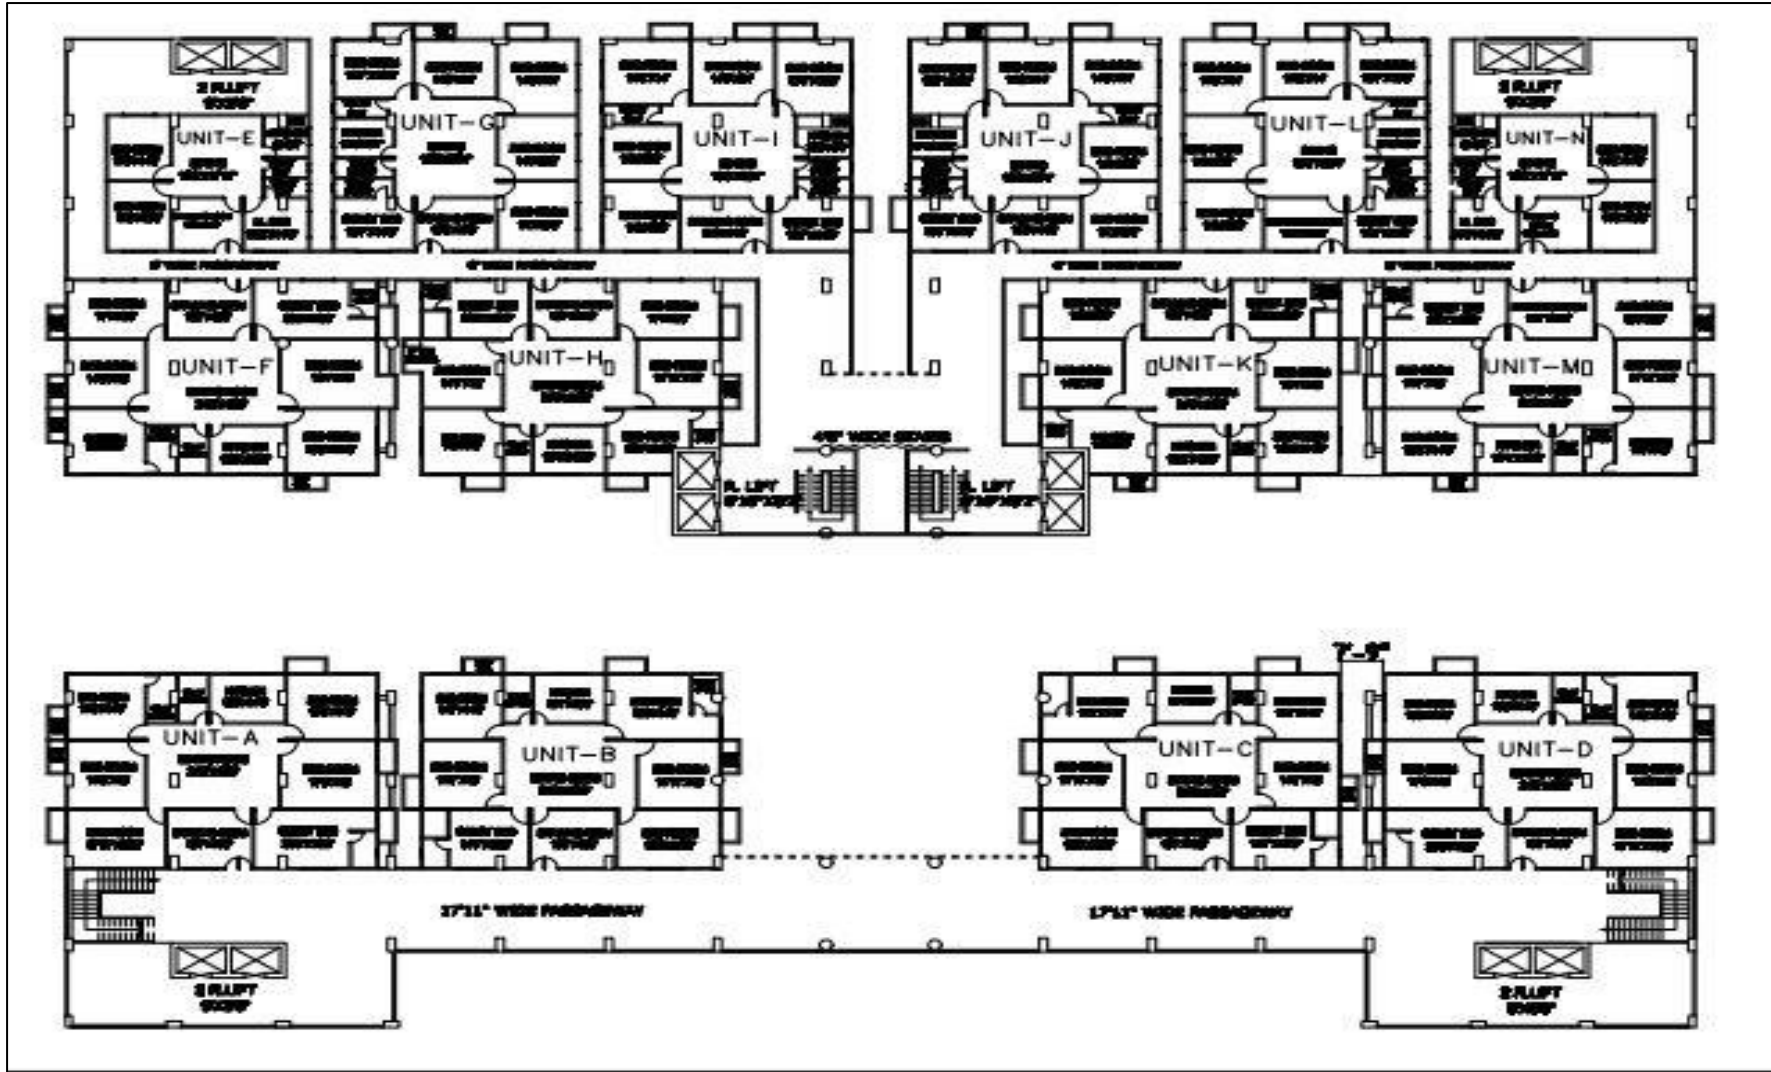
(h): 8<sup>th</sup> to 19<sup>th</sup> Floor Plan (Residential)
